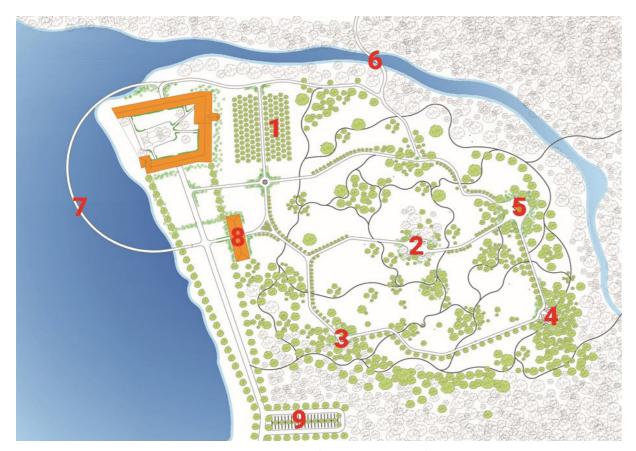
Area plan regarding the landscape proposal for the monastery's site
